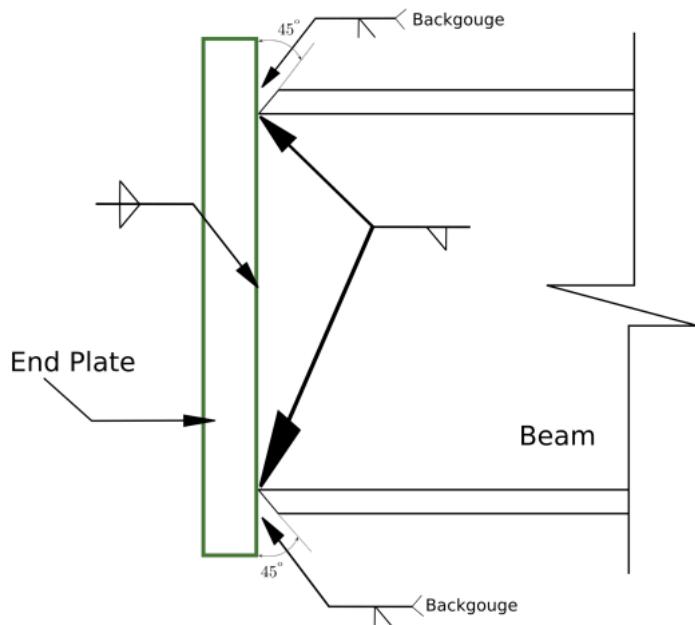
Typical Weld Details – Beam to End Plate Connection
